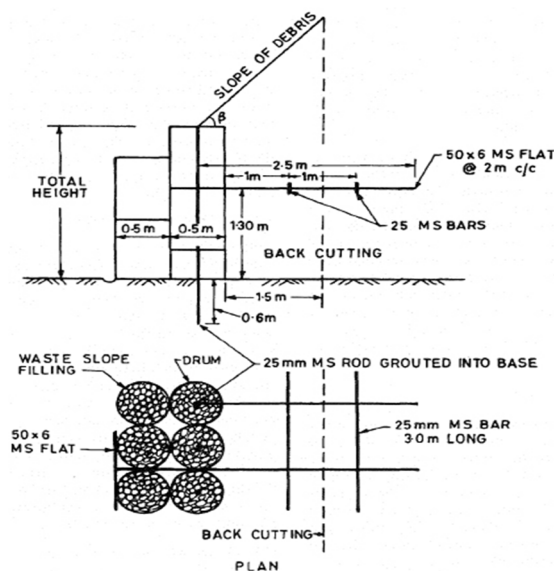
Anchored Drum Diaphragm Wall Built of Slope Waste and Empty Bitumen Drum
